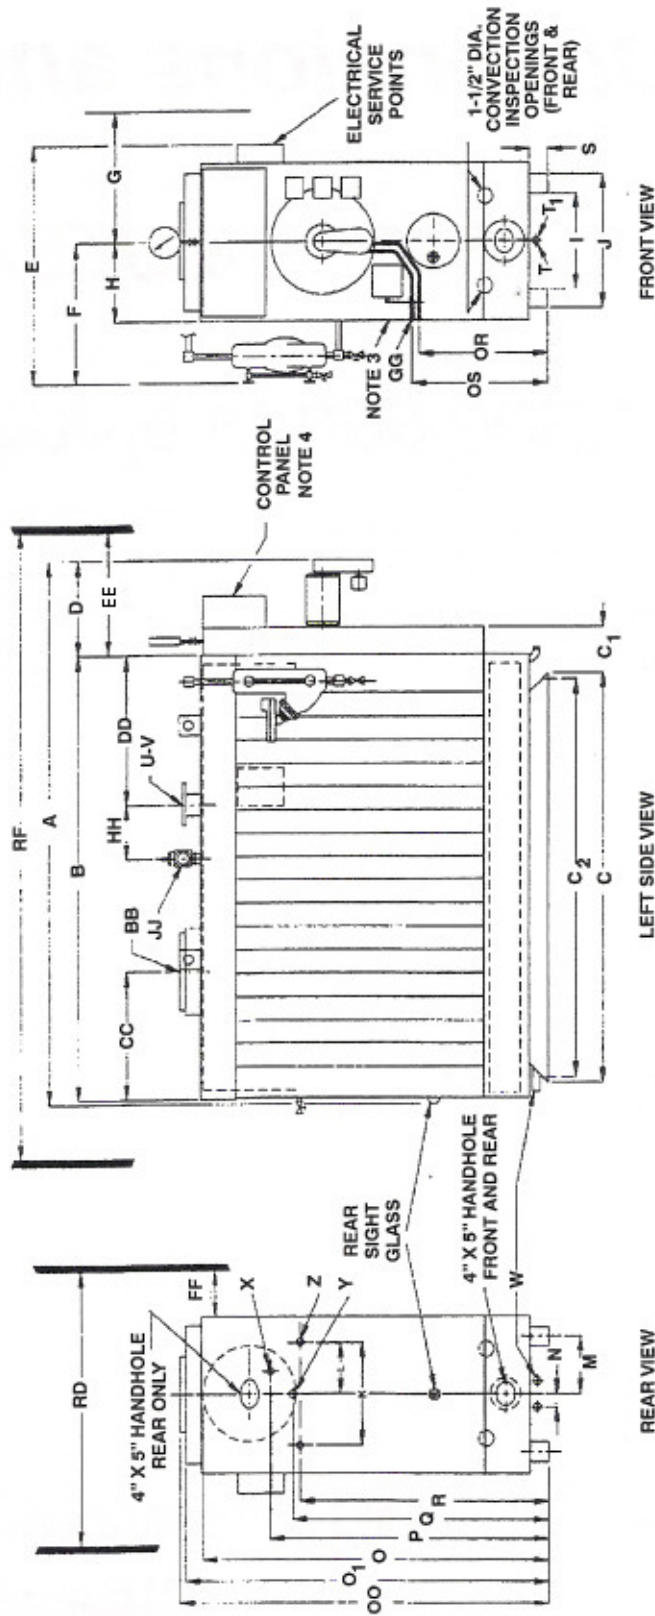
Model 4 Dimensions (sheet 2 of 2)
